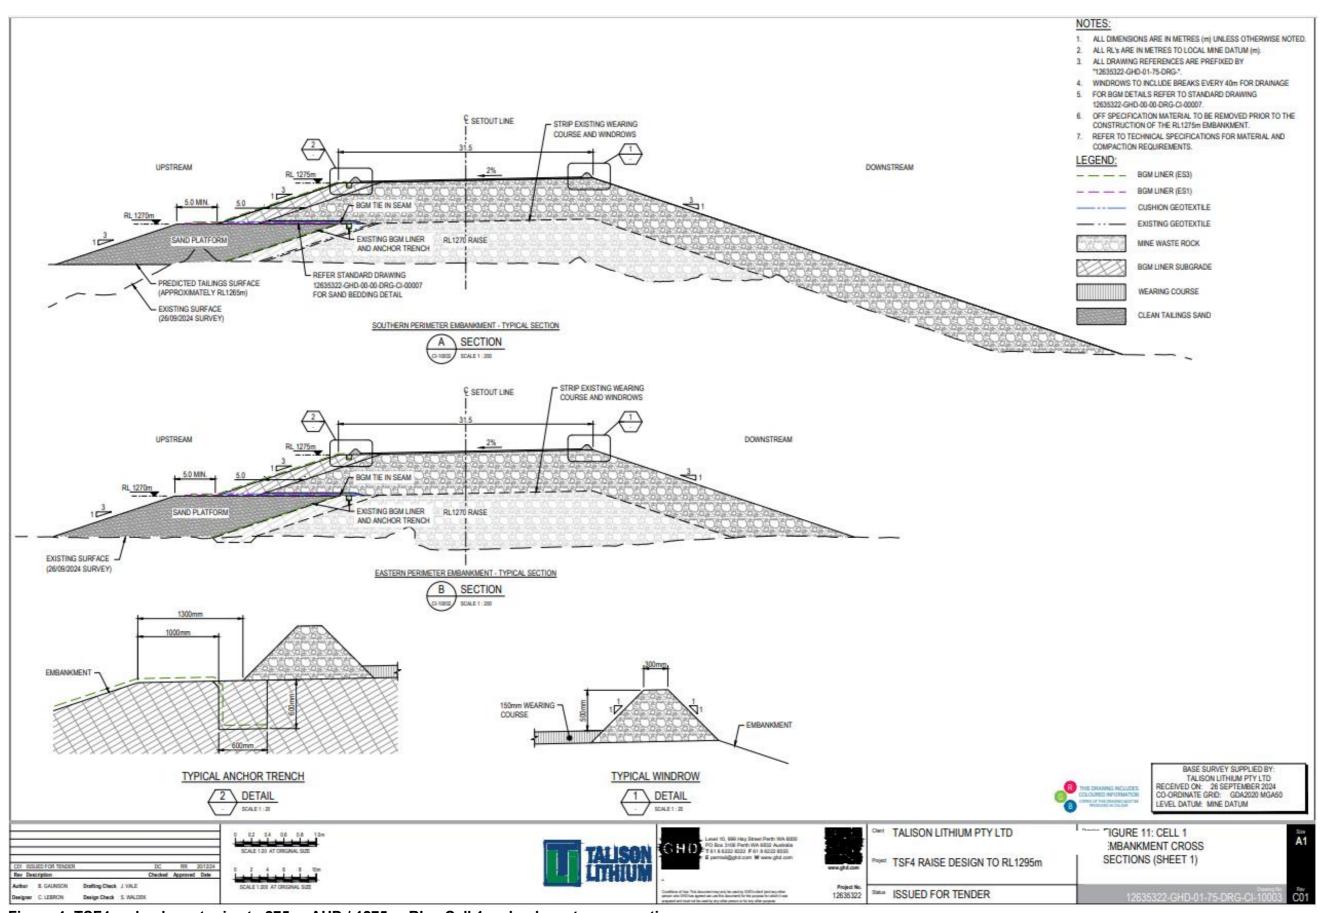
TSF4 embankment raise to 275 m AHD / 1275 m RL - Cell 1 embankment cross sections
